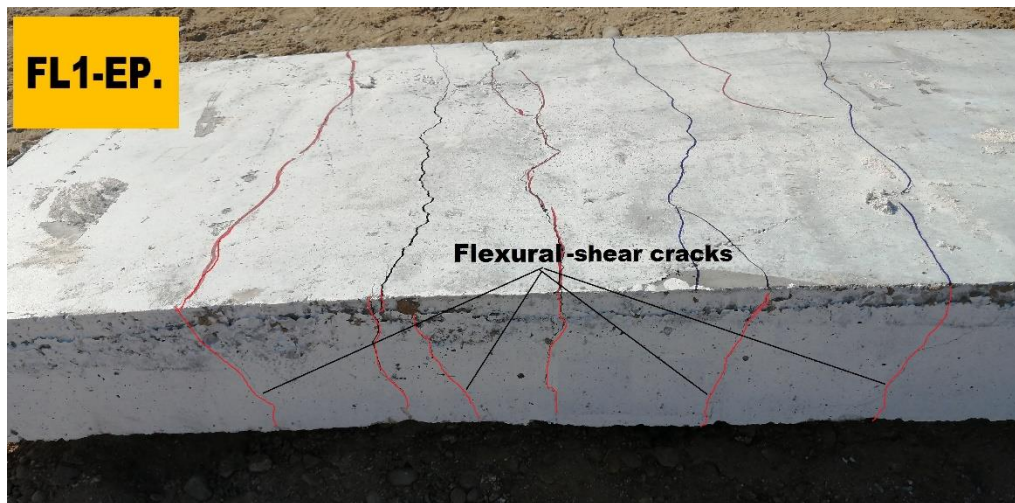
Mode of failure and crack patterns for specimen FL1-EP.
